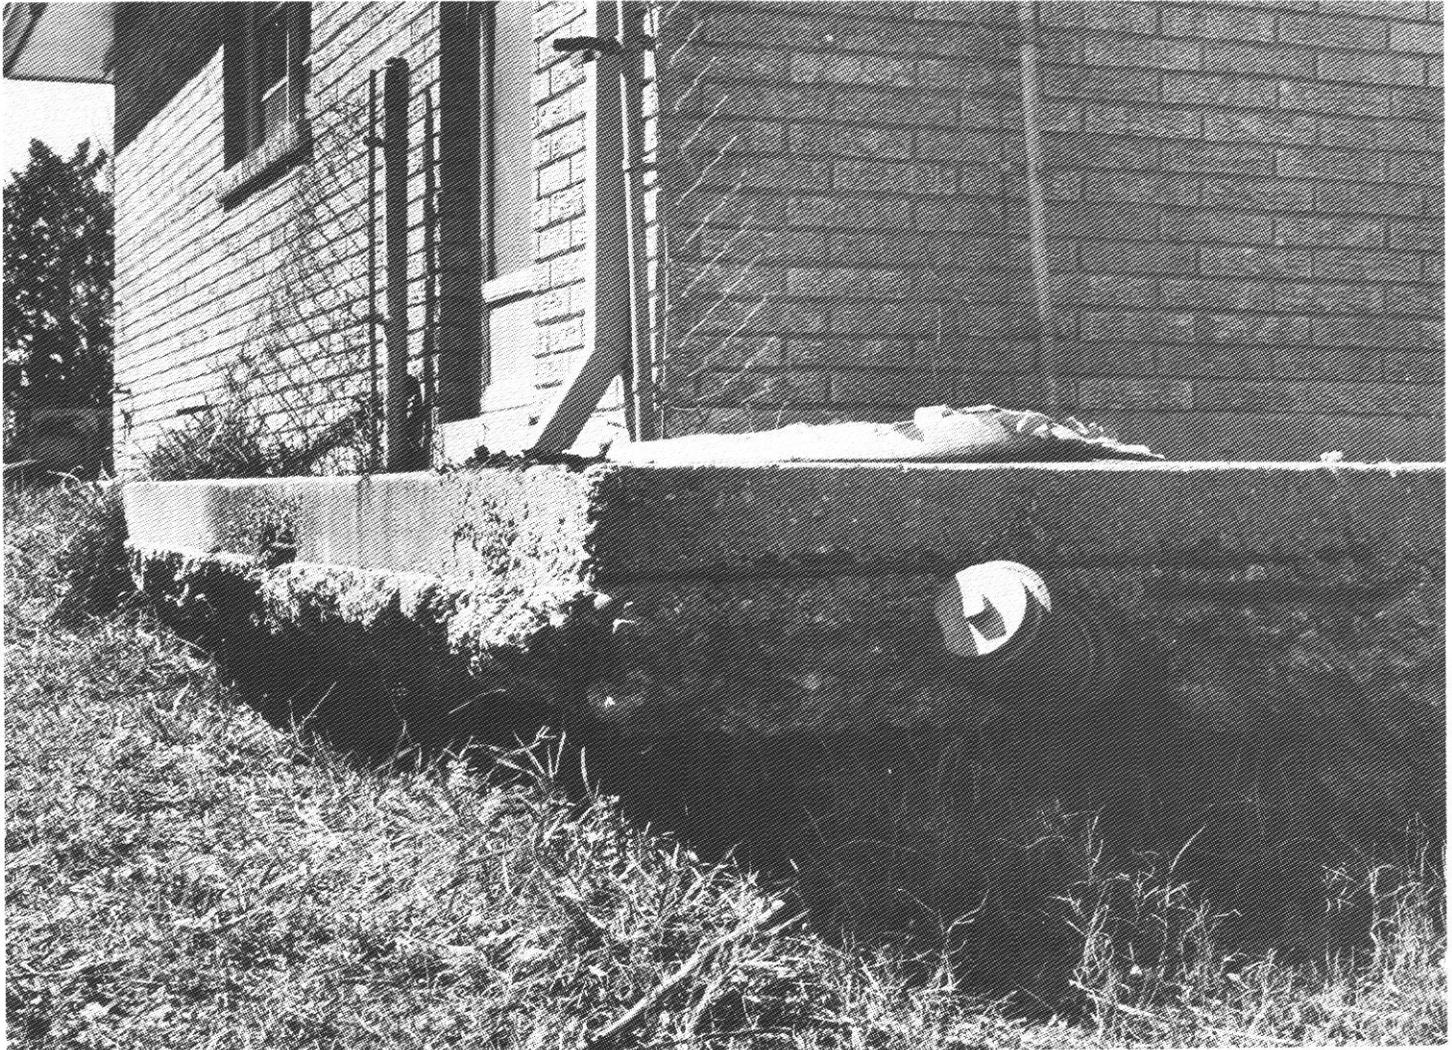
Subsidence severely limits Kenner muck, drained, for urban uses because building foundations are exposed and utility lines are damaged.
